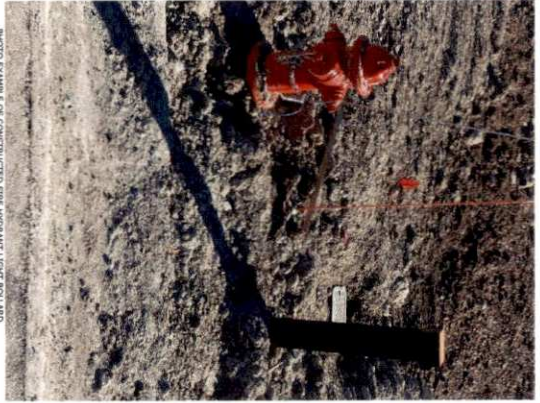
PHOTO EXAMPLE OF CONSTRUCTED FIRE HYDRANT LIGHT BOLLARD
